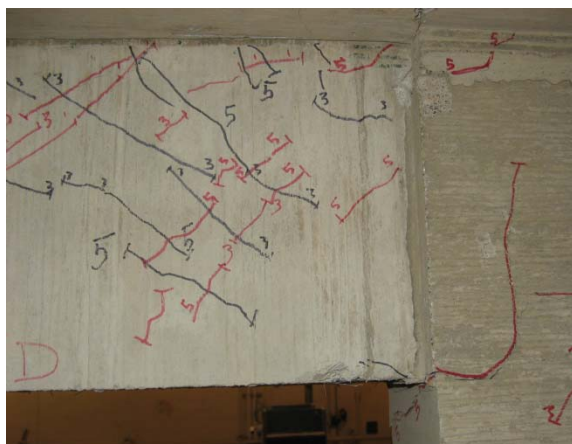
Damage typical of coupling beams in Specimen CW-1 at a system drift of 0.75%. Cracking near the termination of the longitudinal beam reinforcement is evident in the wall.
